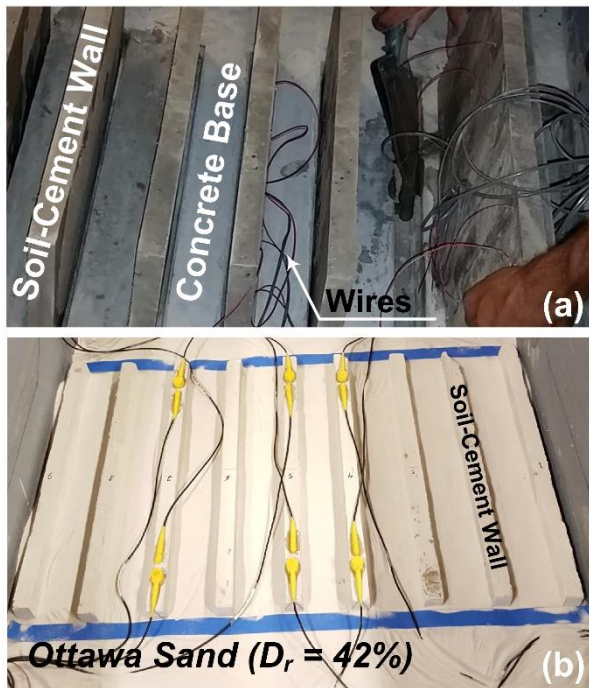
Model construction procedure: a) soil-cement wall attachment to the concrete base, b) soil-cement walls after construction and sand pluviation.
